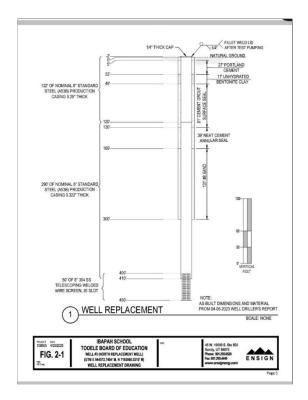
Example of well that was built by school district and the proposed project will be built similarly to this.
